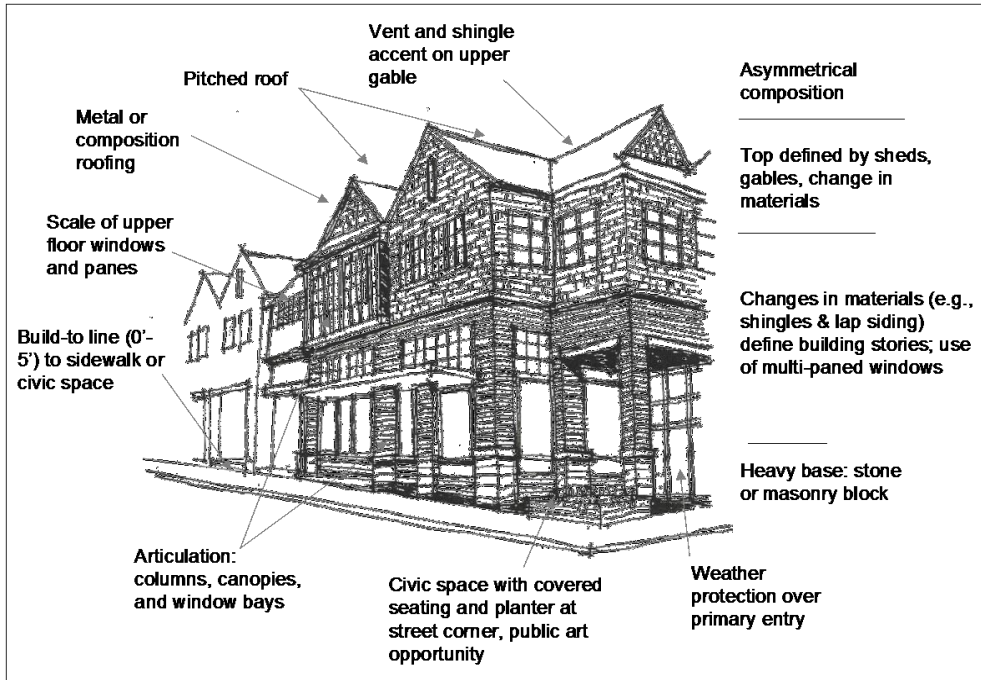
F: Typical Building Elements in Sandy Style (Mixed Use Example)
